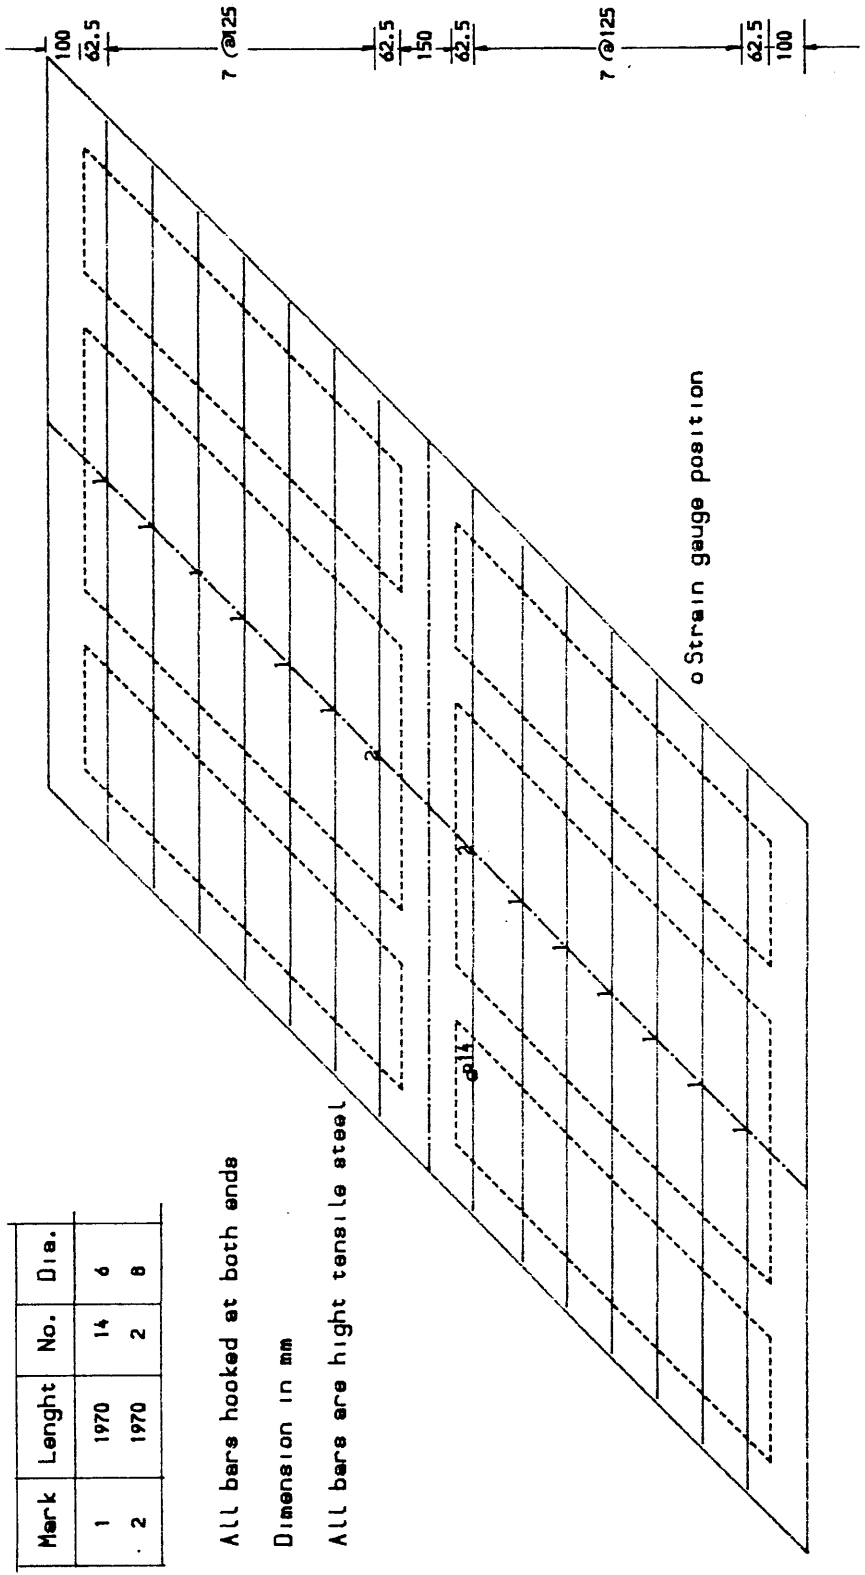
MODEL RIBBED SKEW SLAB NO. (6) Details of the bottom transverse steel and strain gauges position in the slab.
